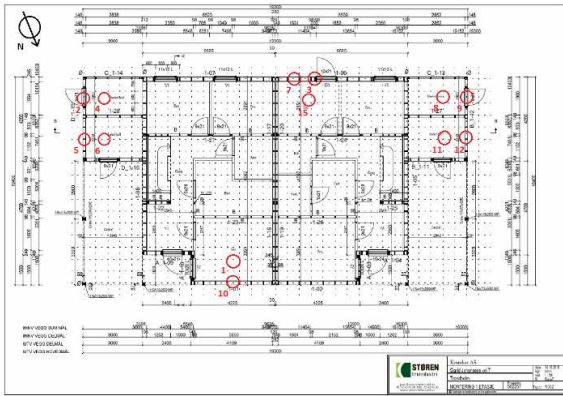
The first floor of the building, with sensors on the floor slab indicated with circles
